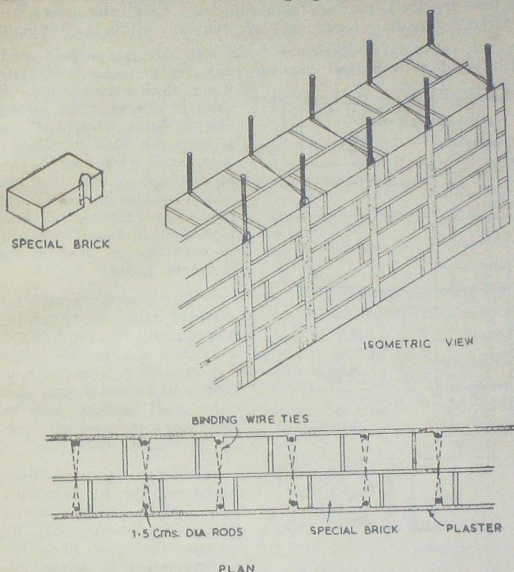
Reinforced brick wall details using mesh reinforcement.
